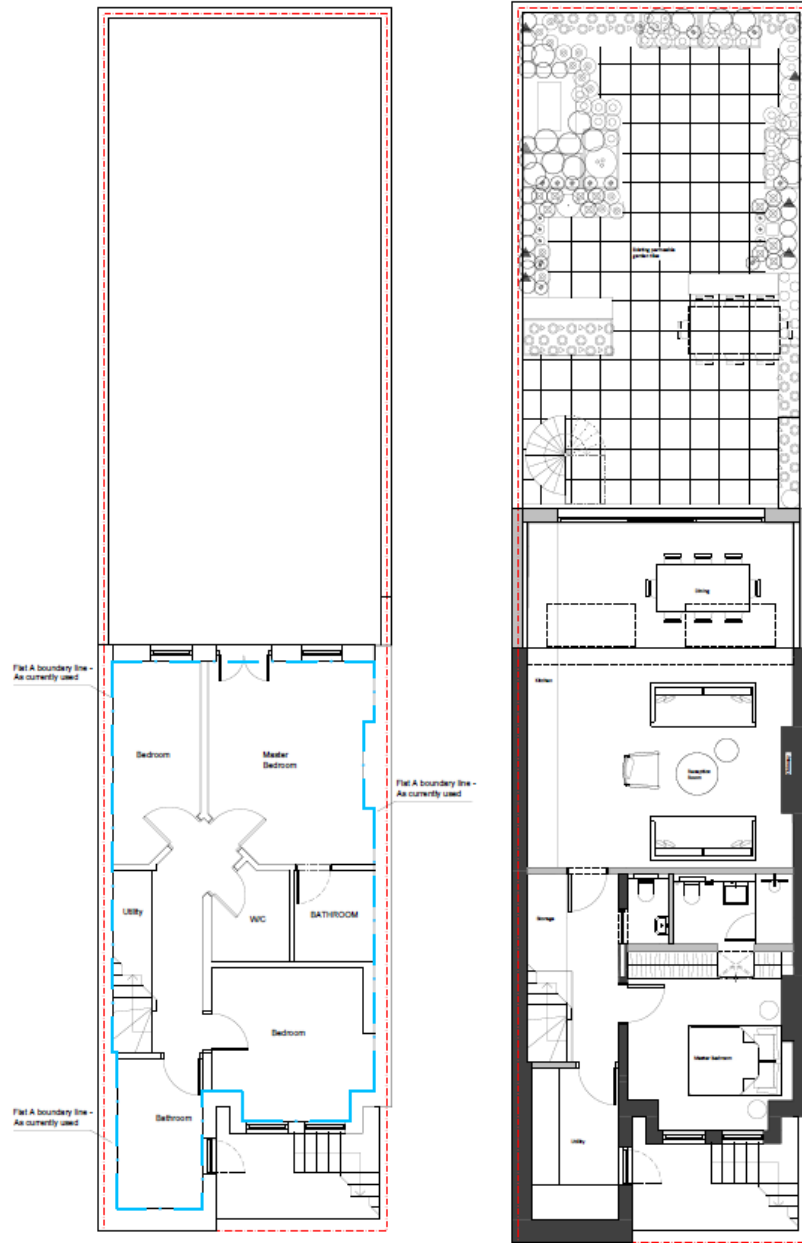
Existing and Proposed Lower Ground Floor Plan.
